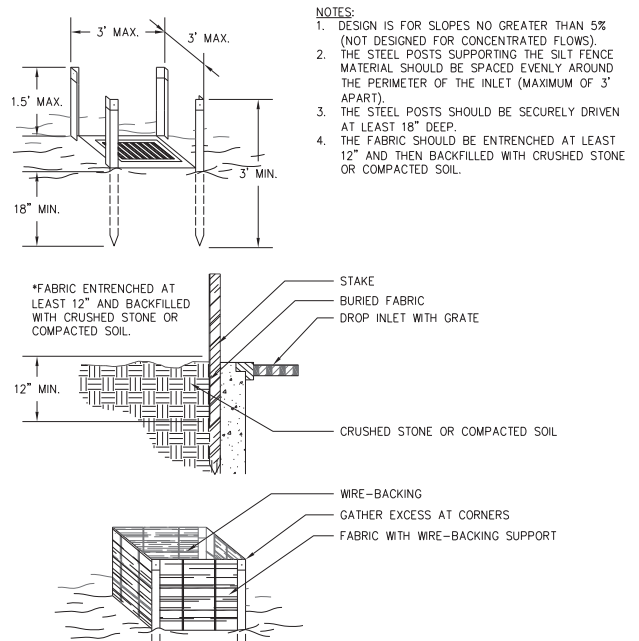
Filter Fabric with Supporting Frame Installation Requirements (Sd2-F)
